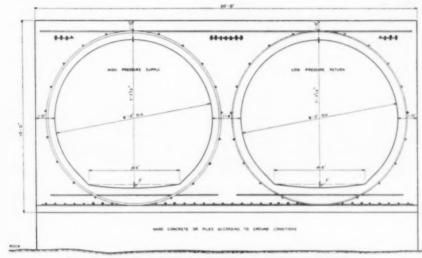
Cross Section of Reinforced Concrete Culverts.
